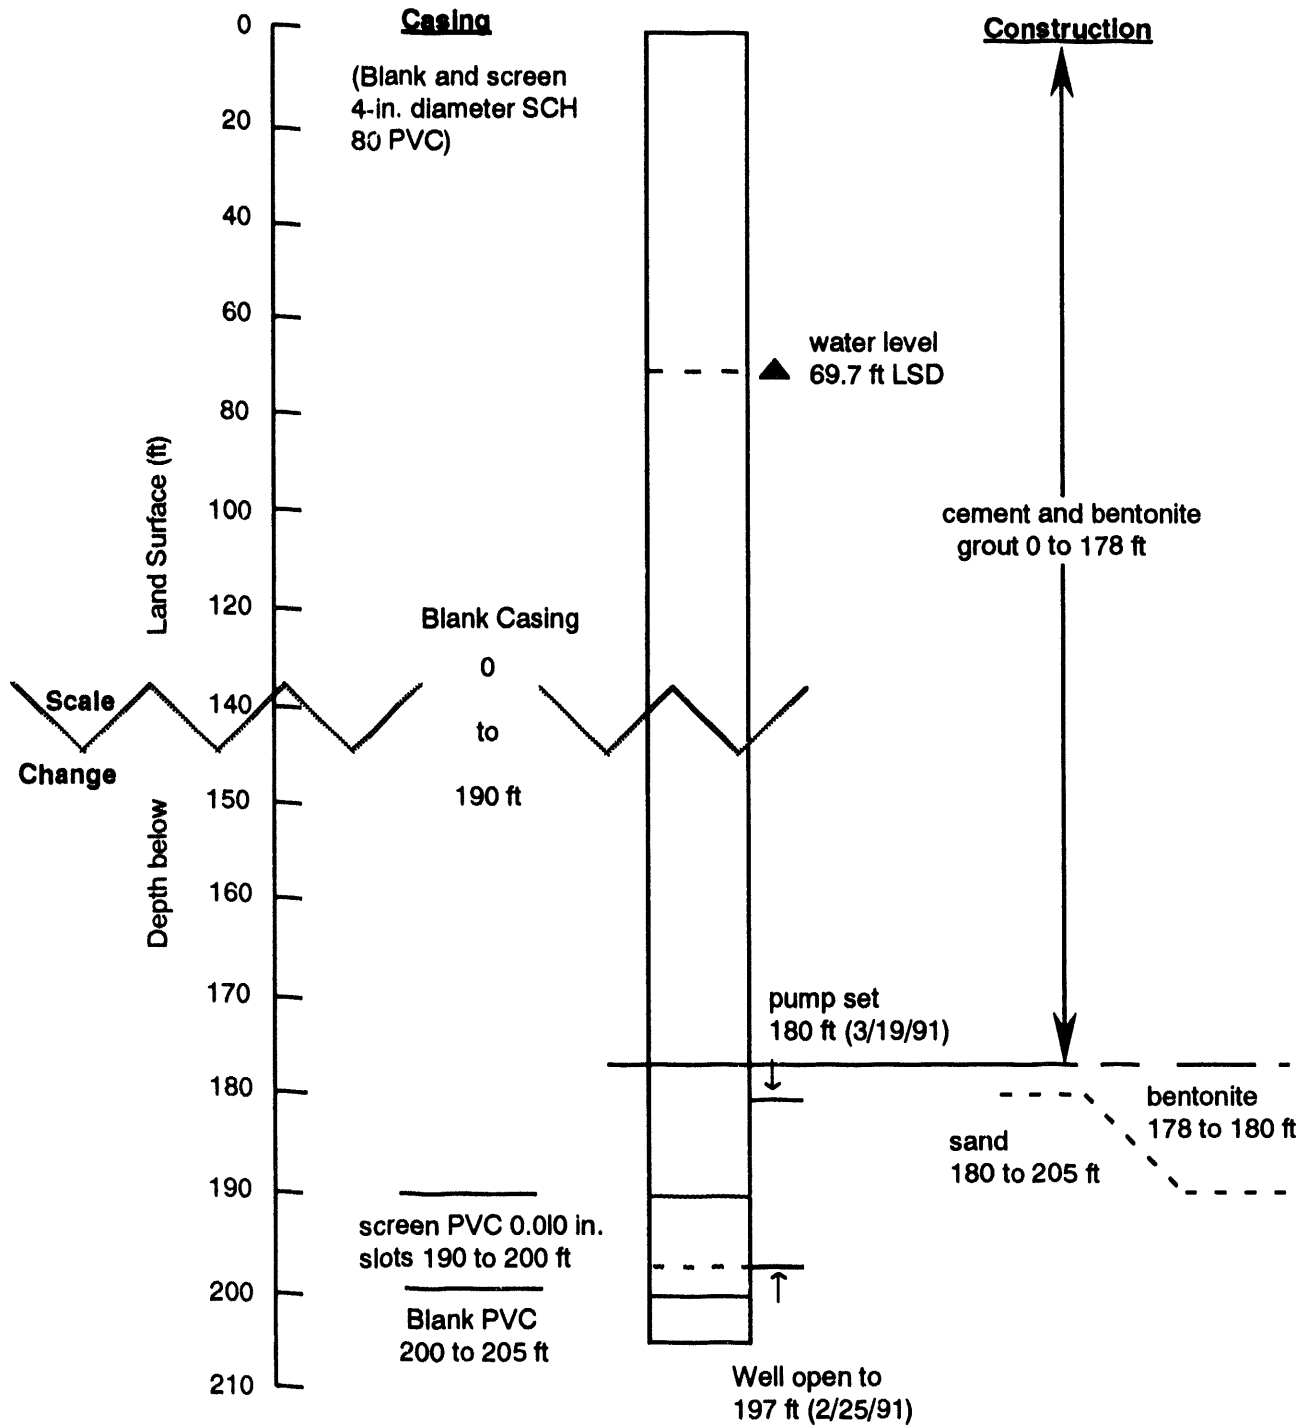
Well construction, water level (2/25/91), and pump setting on monitoring well Site 65.
